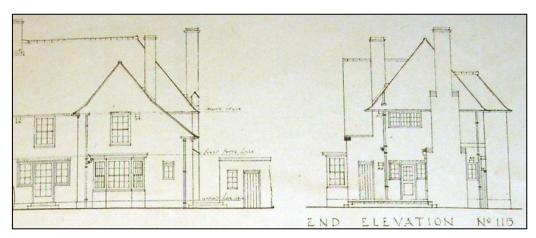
1948 rear and side elevation designs of 115 Willifield Way (Hampstead Garden Suburb Trust)
